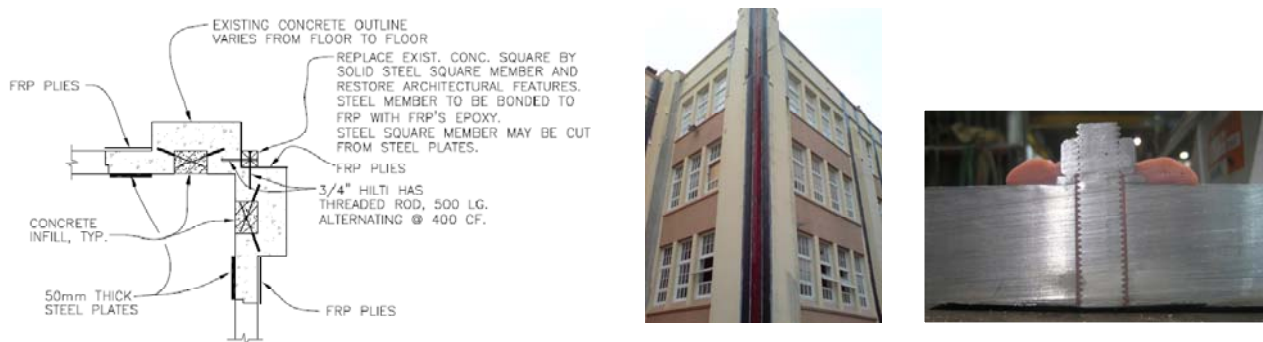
Upgrade of Buttress with FRP and Steel Plates
